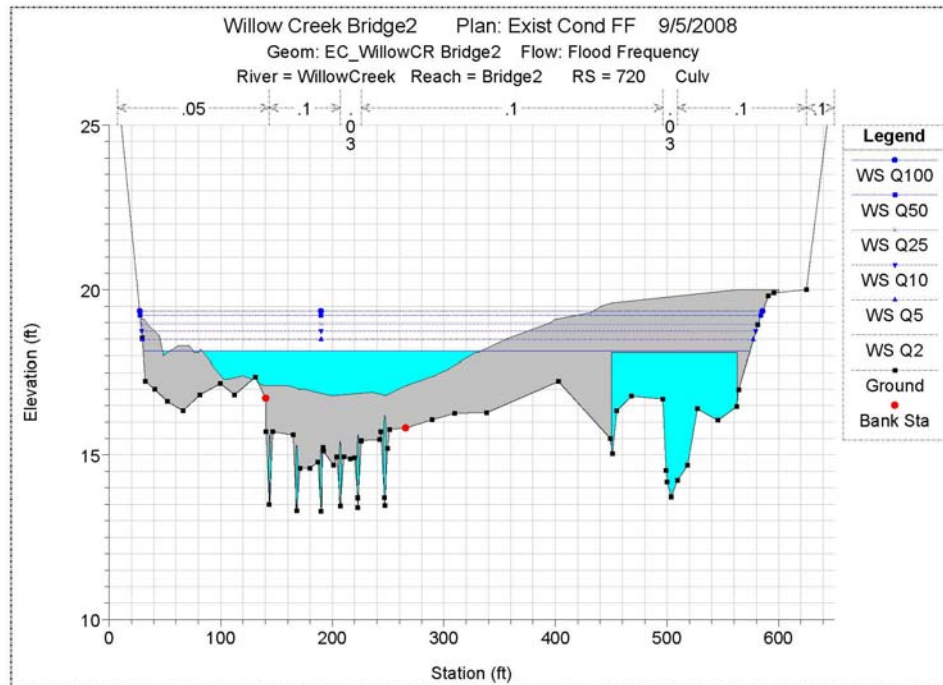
Hydraulic model results of the existing conditions at the Second Bridge crossing looking downstream at the road (dark grey is the road fill). Note that all flood flows overtop the road at the culverts on left side of the image.
